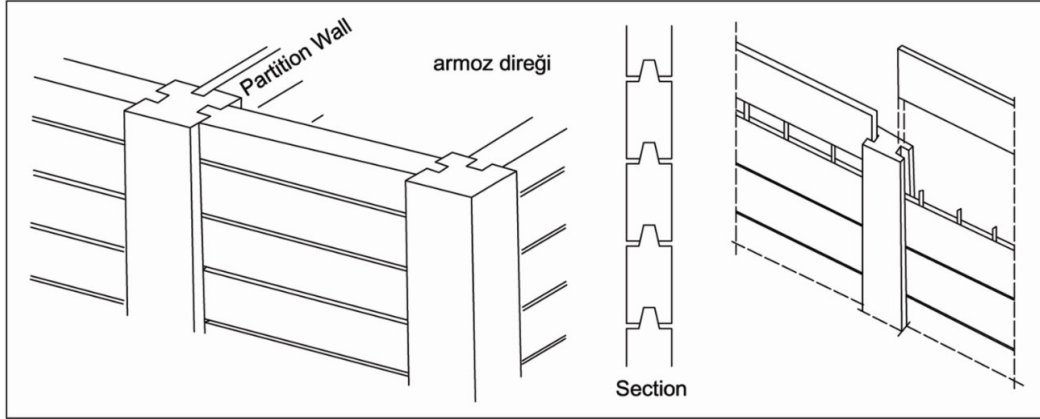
Channels (*kınış/keniş*) in the “çalma boğaz” joint system, section and wooden nails (*mih*) (Author)
